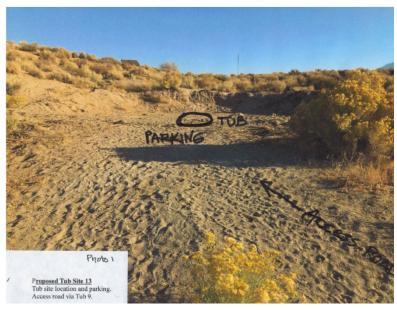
PROPOSED TUB SITE 13 (DECEMBER 2020)
